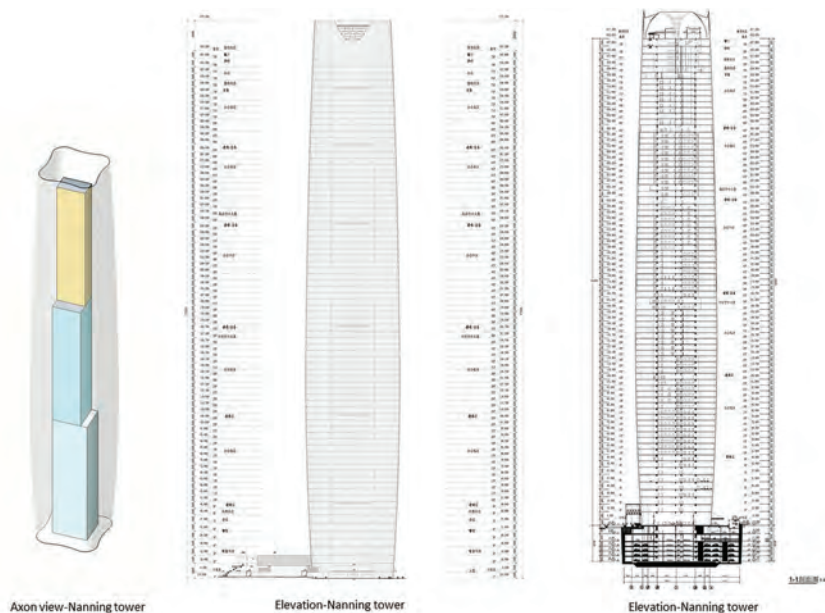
Nanning Tower elevation and section plans (Source: Yu Wang, THAD)
